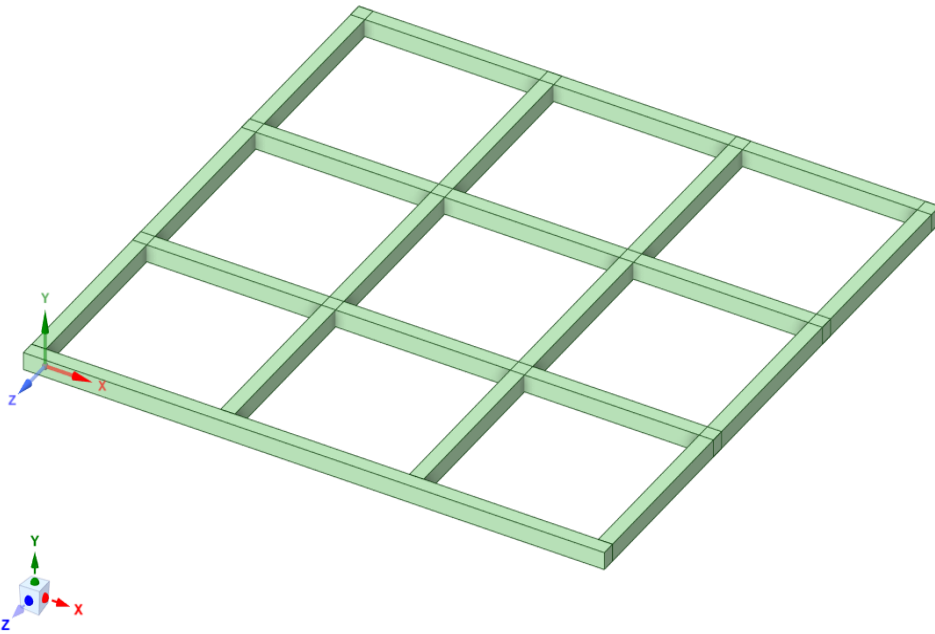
Geometrical Drawing of Beams Between Supports Under The Slab.
